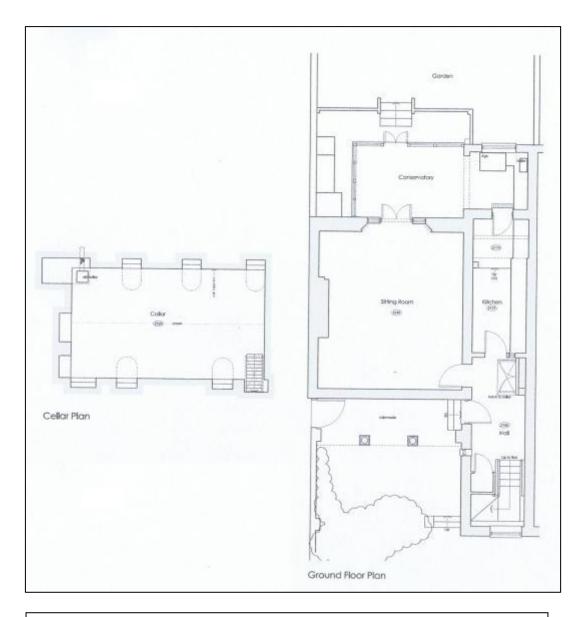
1 Whitefriars, Rye: Plan of ground floor and cellar (Adapted from plan provided by Manning Duffie Architects Ltd)
